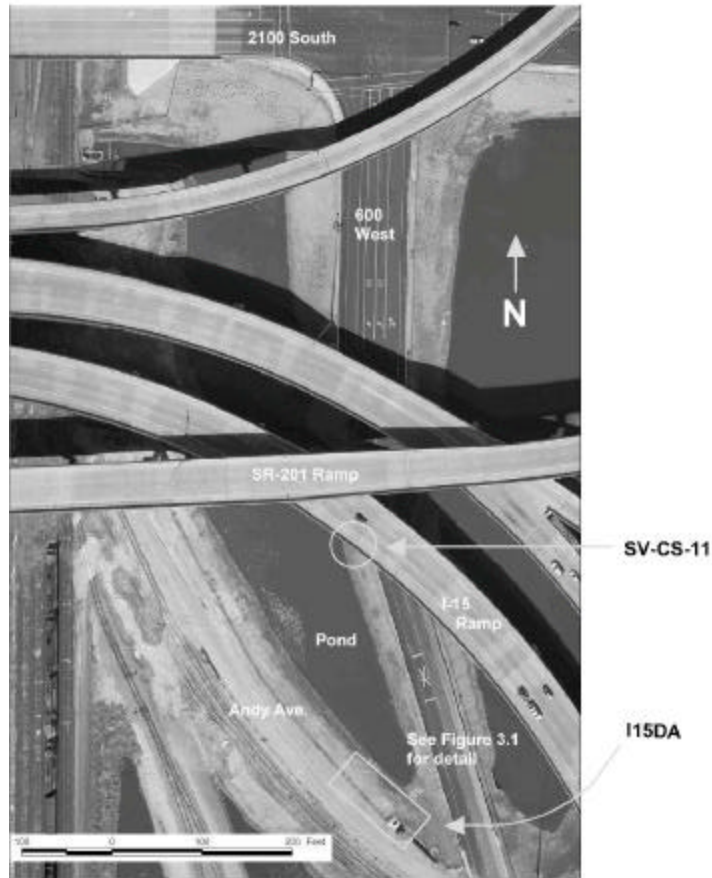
Aerial photograph of ramps from SR-201 to I-15 (after reconstruction of the interchange) showing location of I15DDHA and its proximity to freeway bridges.
